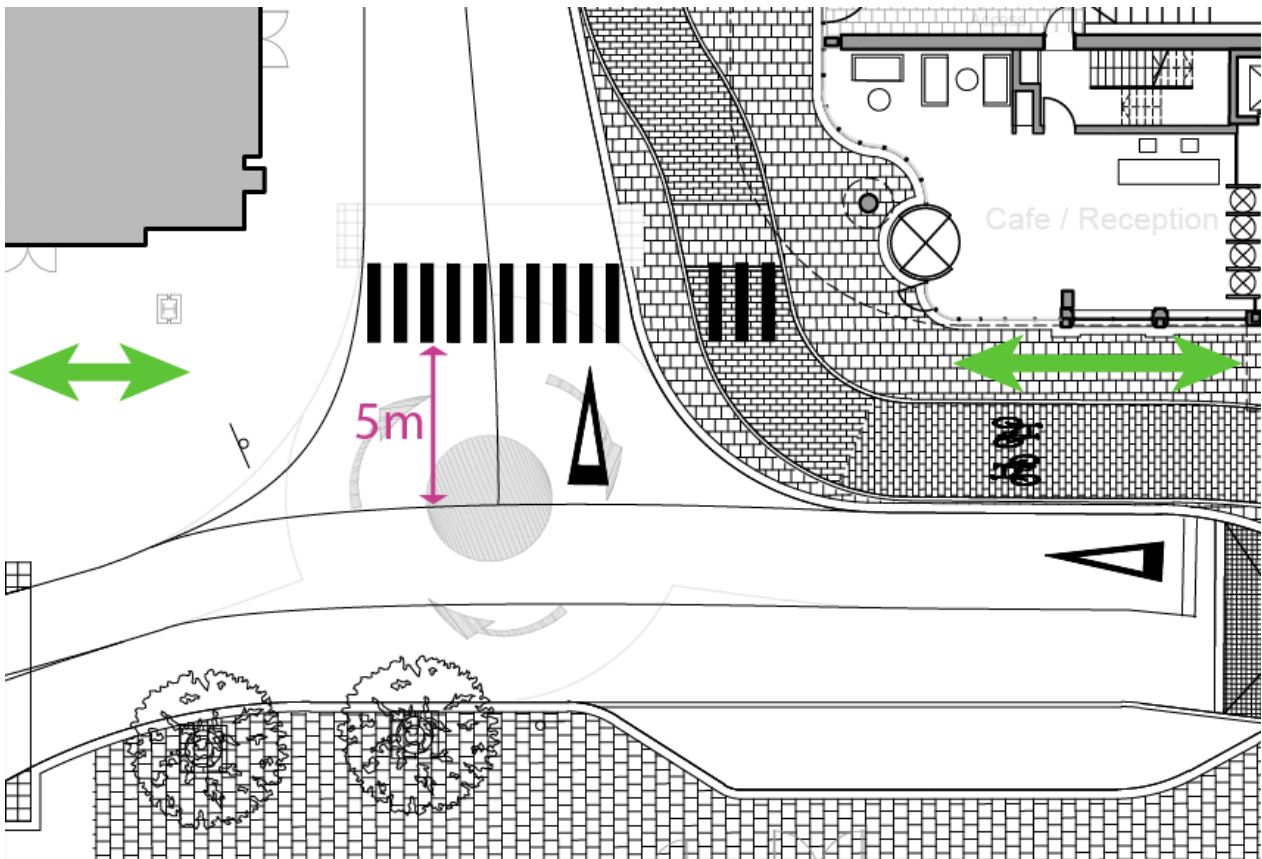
Alternative configuration for replacing the Great Northern Rd mini-roundabout and pedestrian crossing
